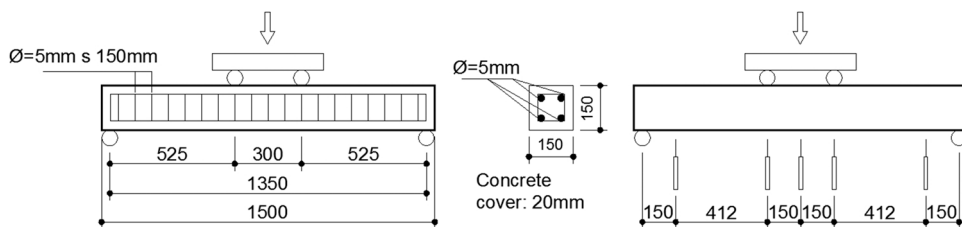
Test setup, beam geometry, steel reinforcement details (left) and LVDT positions (right).
